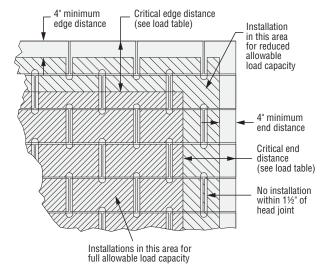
Allowable Anchor Locations for Full and Reduced Load Capacity When Installation Is in the Face of Fully Grouted CMU Masonry Wall Construction
